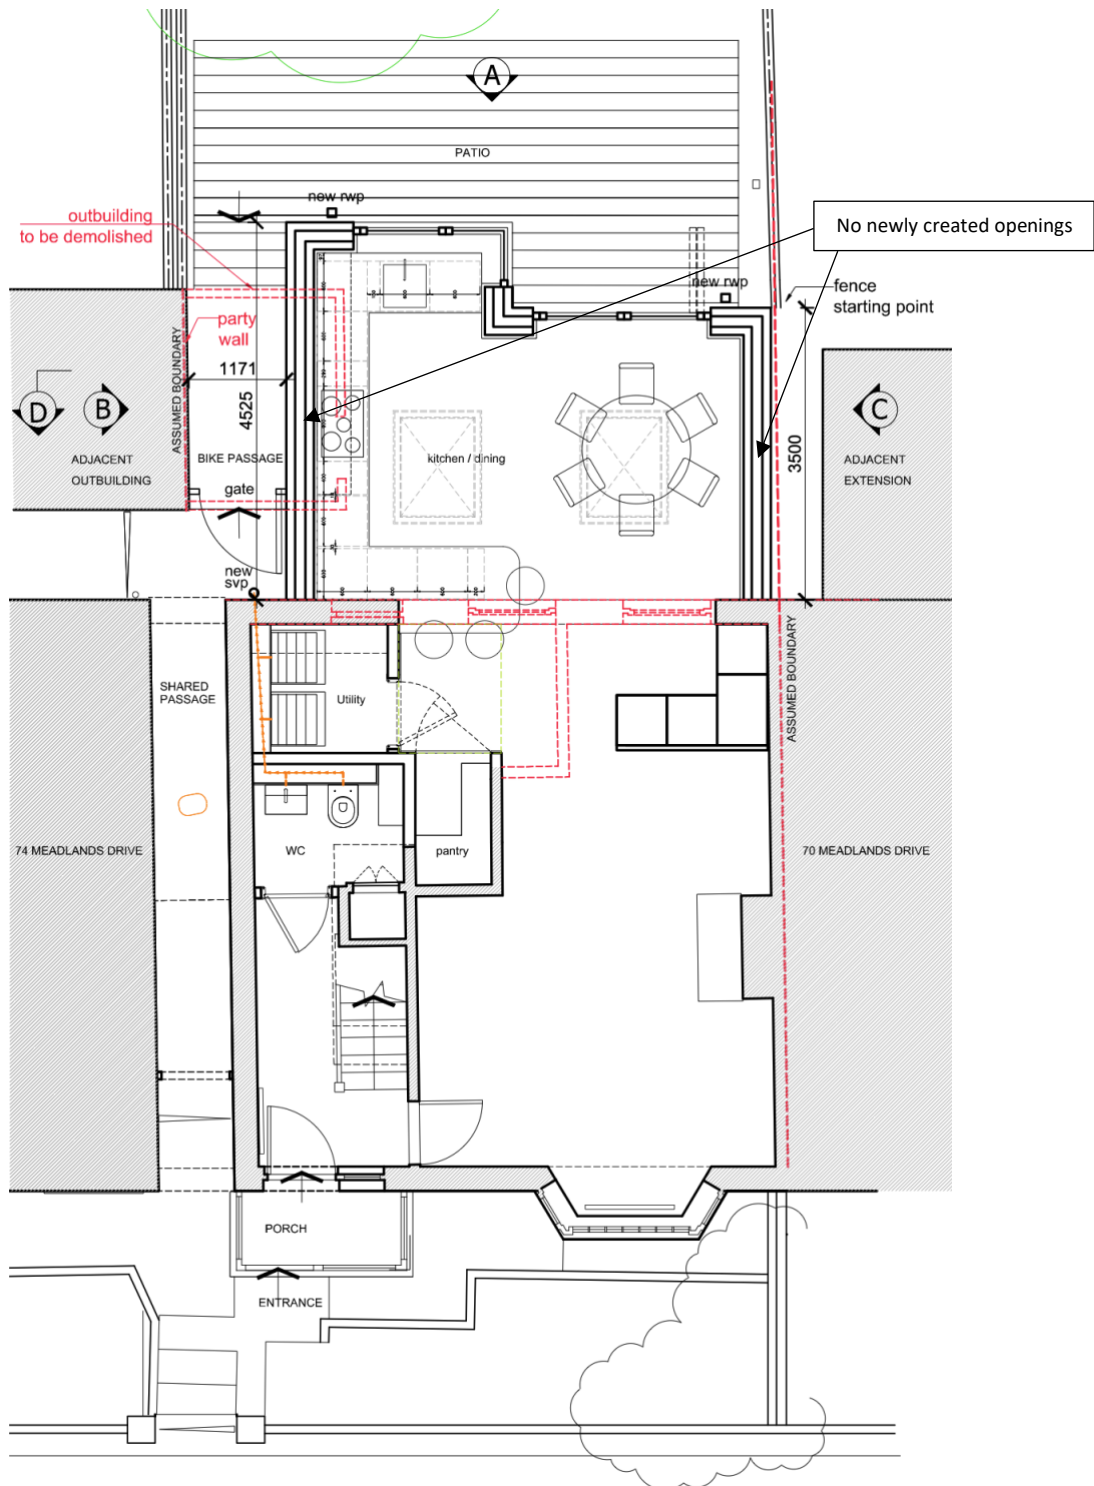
image showing brick façade walls facing neighbouring properties (no openings)
